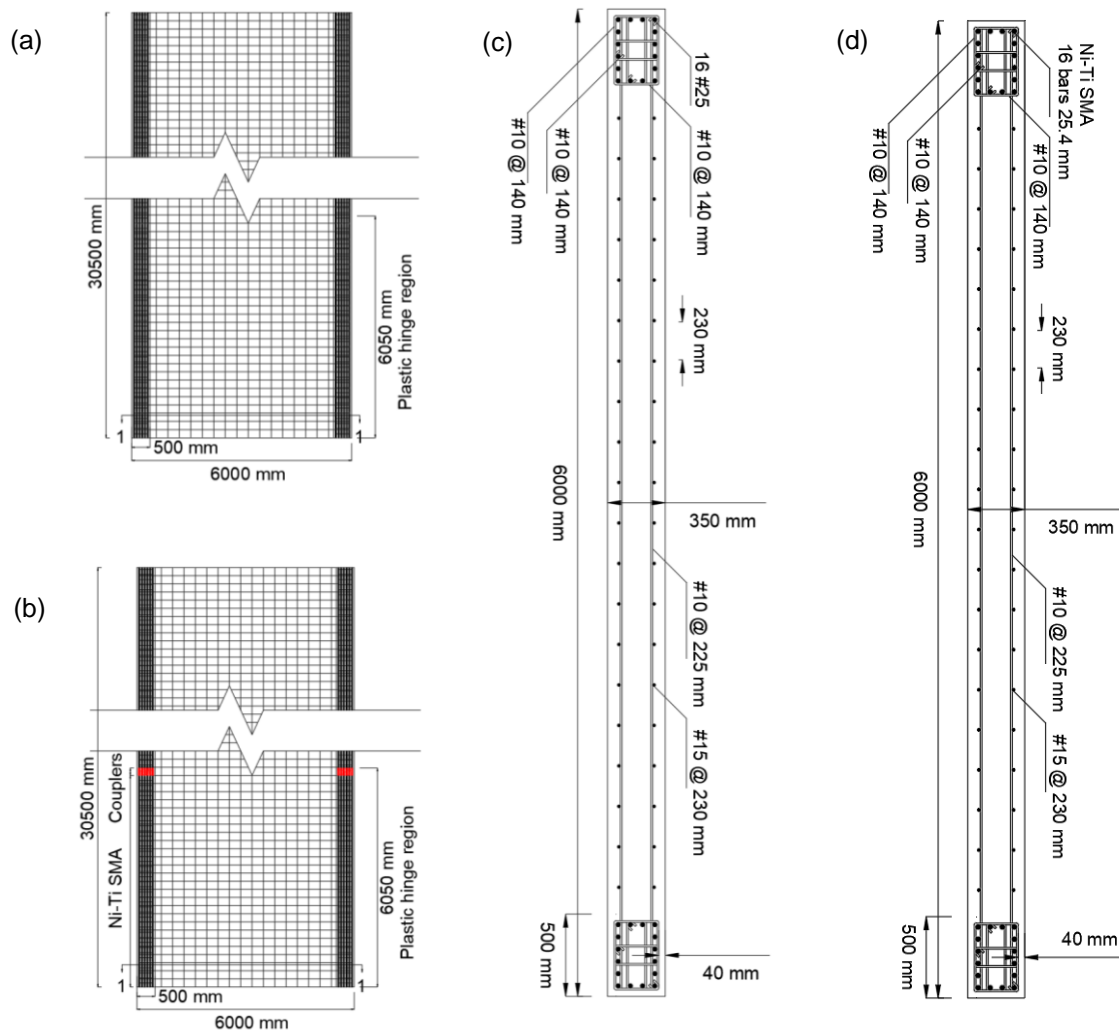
Details of walls: (a) elevation of wall DSRW, (b) elevation of wall DHW, (c) cross-section of wall DSRW, and (d) cross-section of wall DHW
